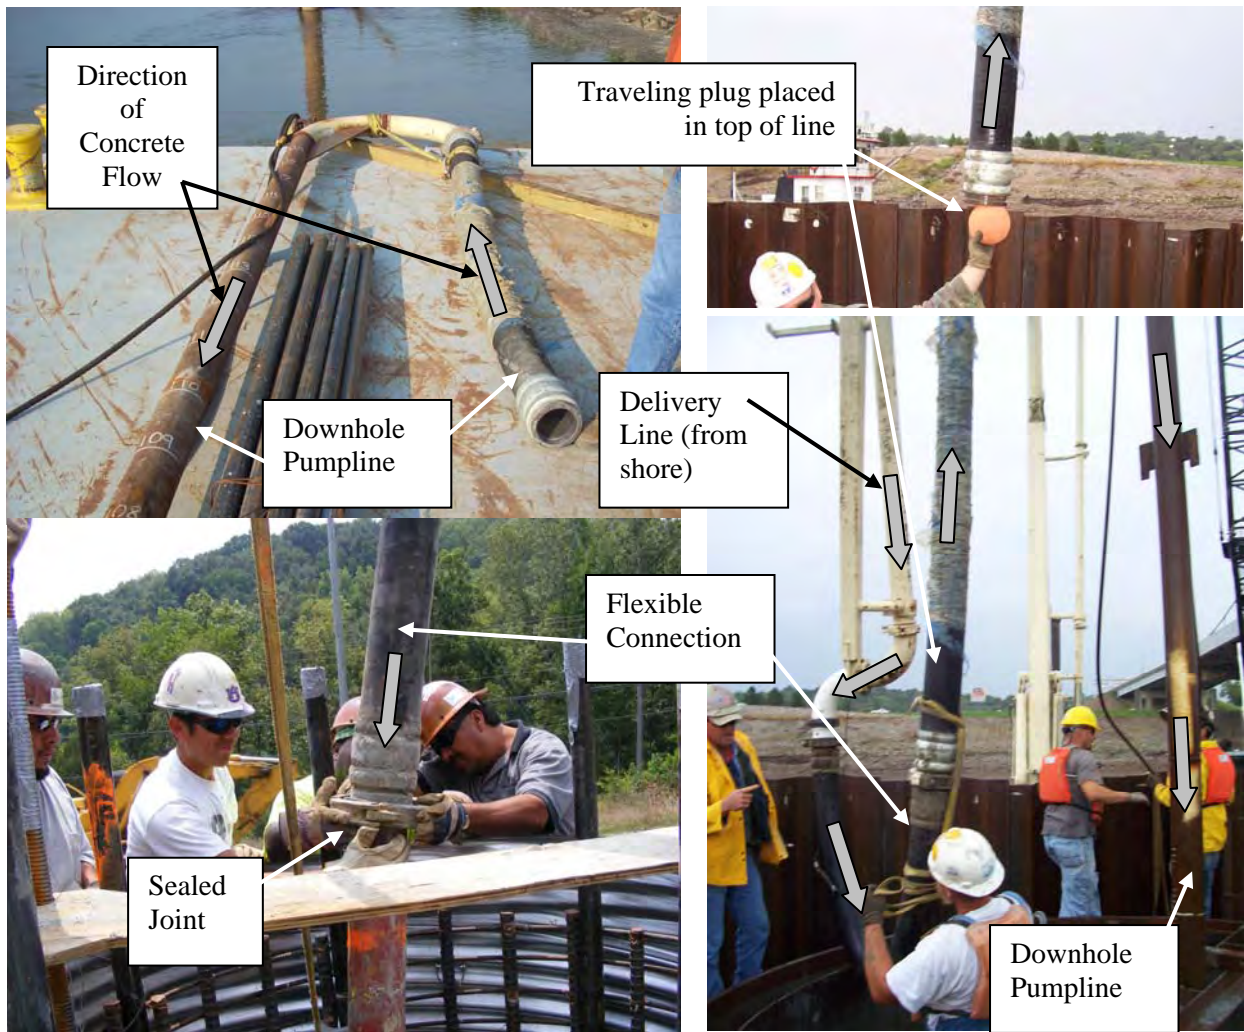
Pump Line Operations for Underwater Concrete Placement
